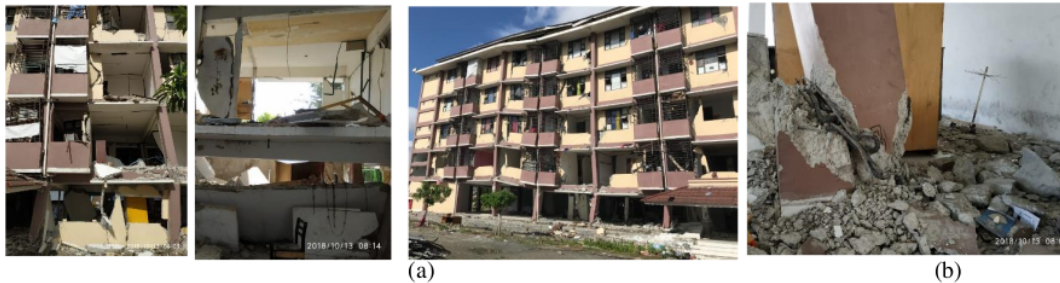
Pictures of damaged rental low-cost housing flat Lere: (a) major architectural damage, (b) major structural damage concentrated on base columns undergone compression failure and combined shear and tensile failure
